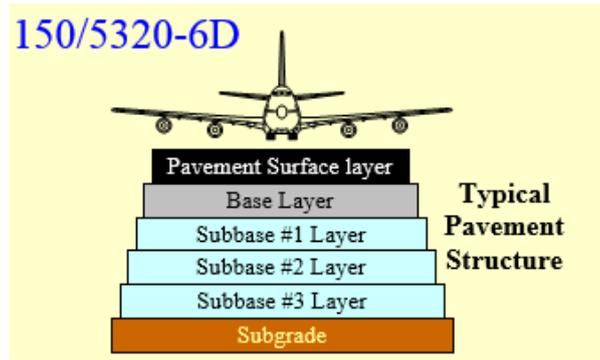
Typical Flexible pavement Structure in F806FAA.xls
